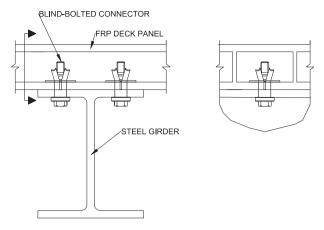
Example of blind-bolted connection between FRP deck panel and steel girder.
